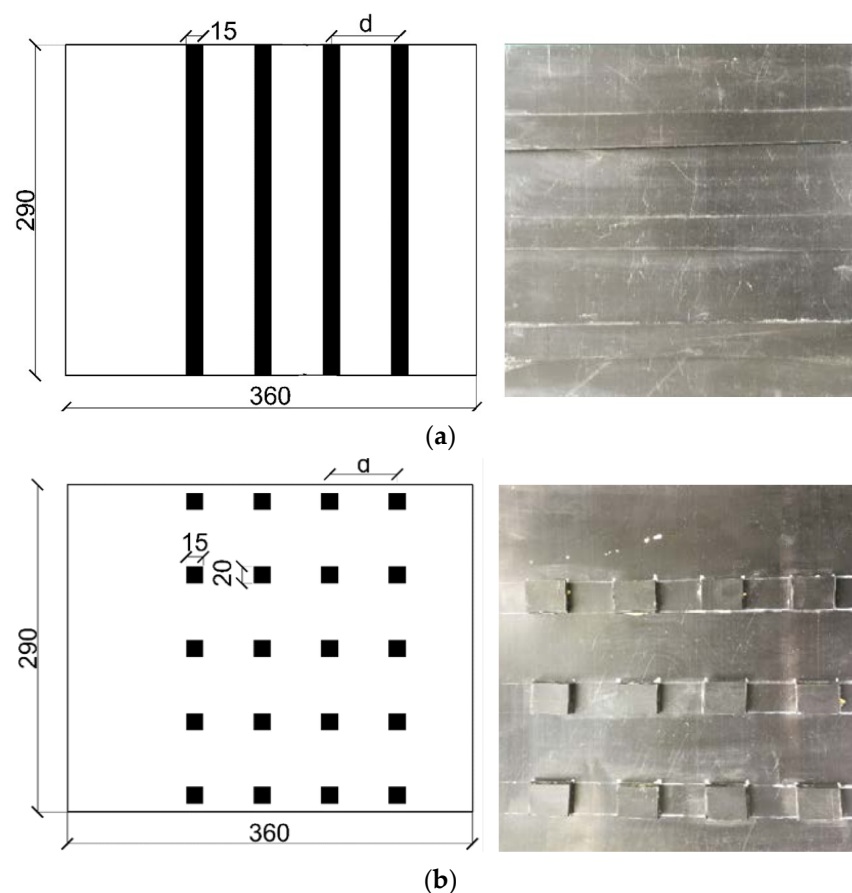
Layouts of ribbed geomembrane samples (unit: mm). (a) Strip rib. (b) Block rib.
